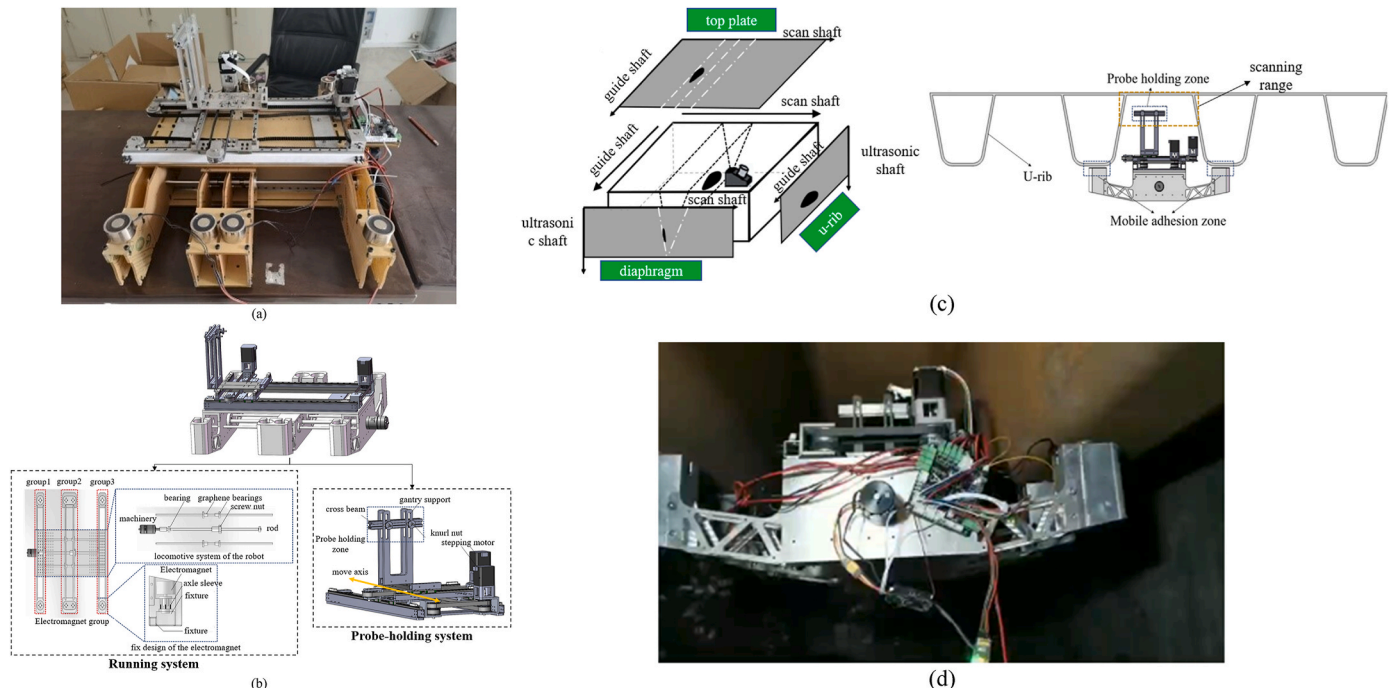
Crack detection equipment: (a) Inspection robot; (b) Schematic diagram of robotic components; (c) inspection range of the robot; and (d) on-site inspection.
